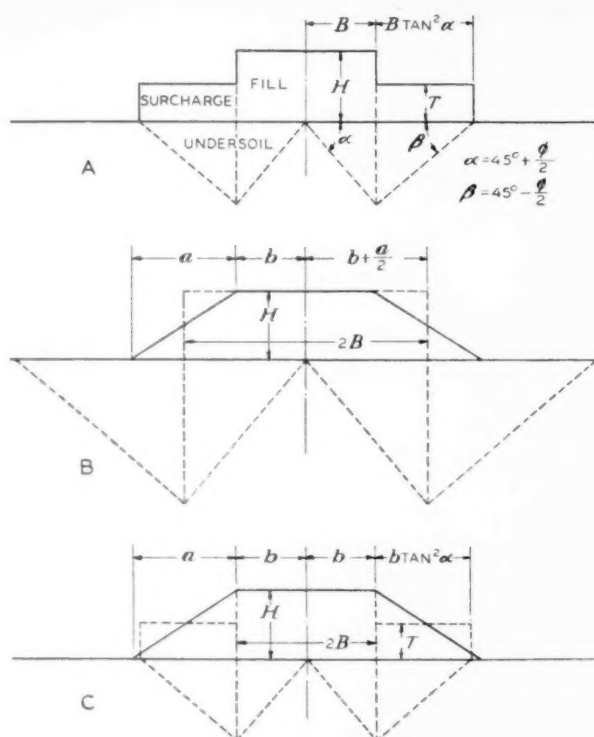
MODIFIED EMBANKMENT CROSS SECTIONS.
